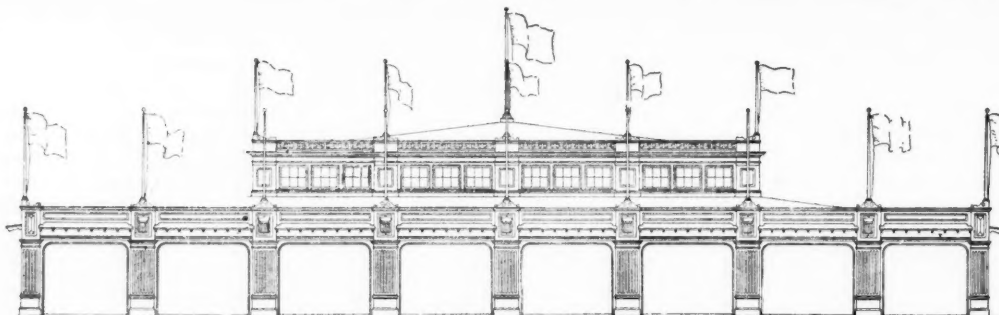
ELEVATION AMERICAN RAILWAY APPLIANCE EX POSITION BUILDING, WASHINGTON, D. C.
